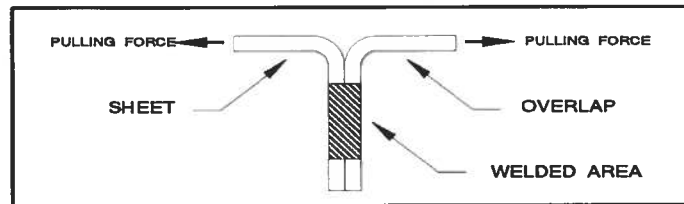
Fillet-Extruded Geomembrane Weld
